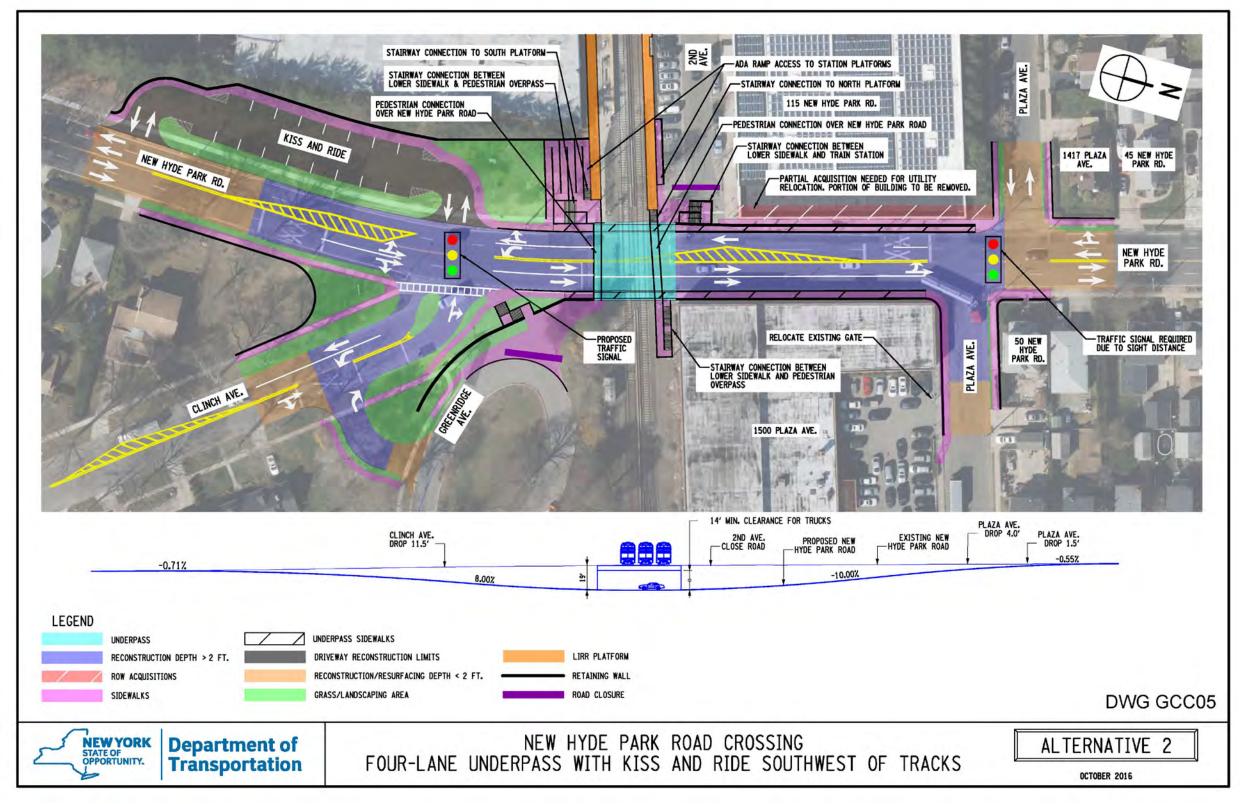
New Hyde Park Road Crossing (Alternative 2: Four-Lane Underpass with Kiss and Ride Southwest of Tracks)
